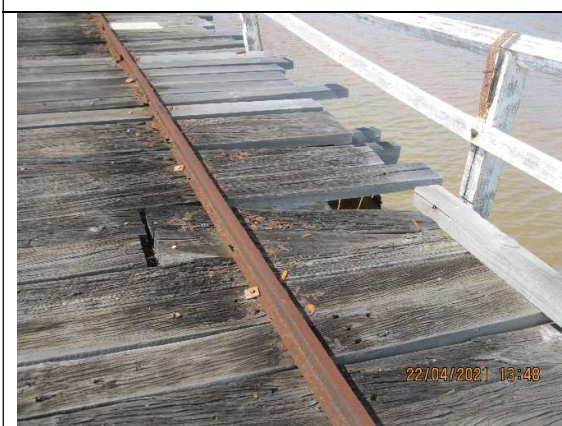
Unsafe deck planks - replaced deck planks can be seen in the background
